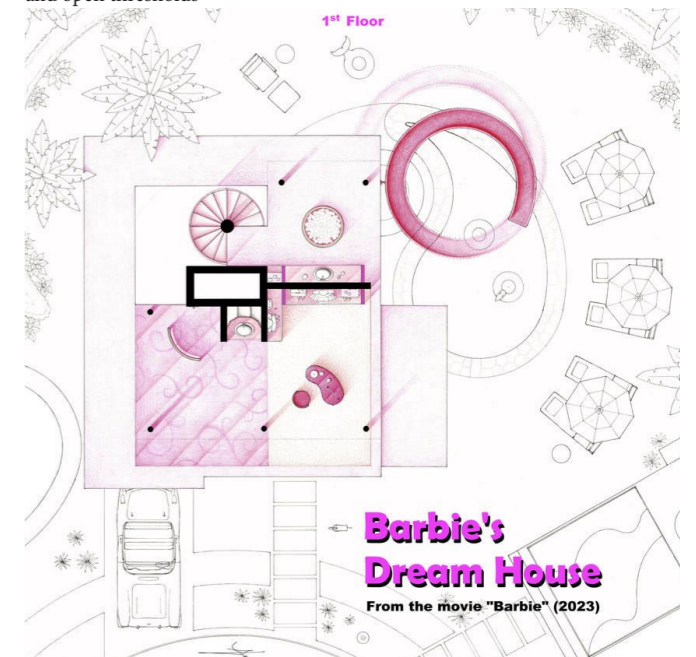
Barbie's Dreamhouse first floor plan with minimal interior walls and open thresholds
